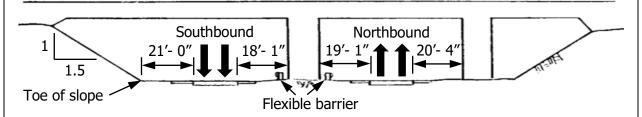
Bridge elevation view of horizontal clearances for separate southbound and northbound highway features below the bridge, with flexible barriers.
